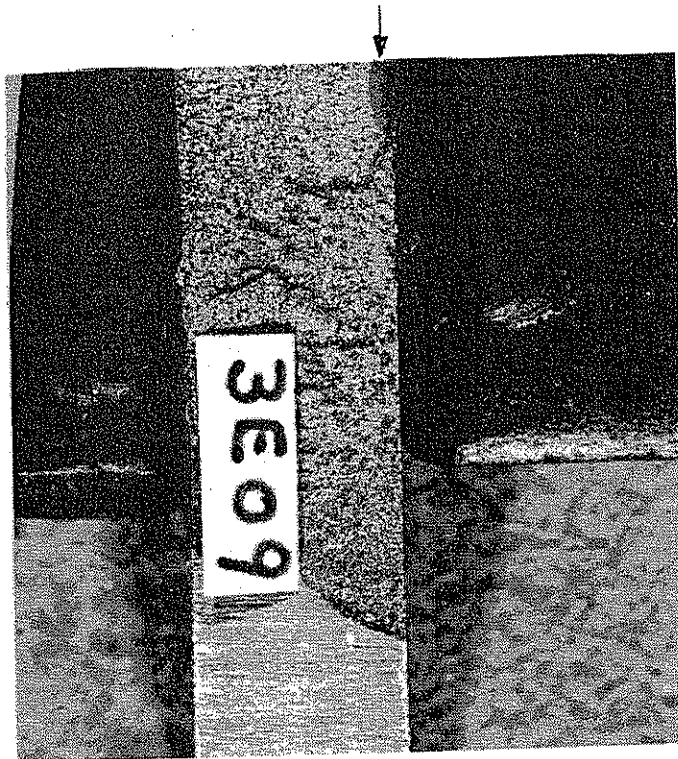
Small fatigue crack at detail 3E09.
